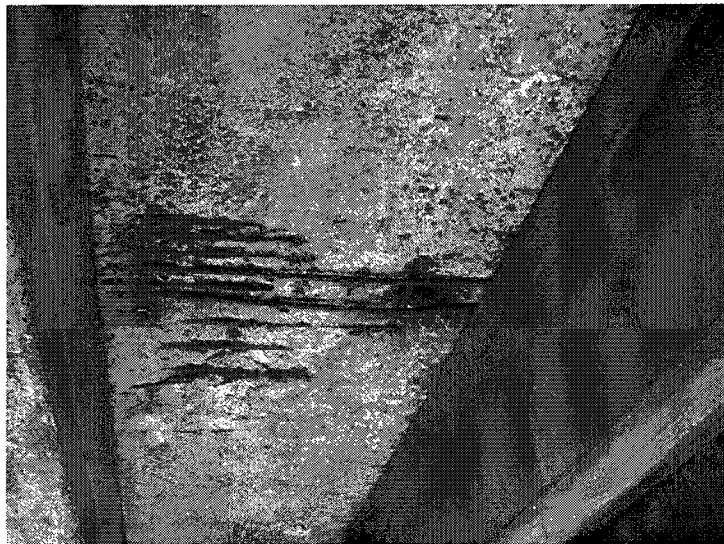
Span 3, Bay #5; Spalled area with corroded rebar extends full width of the bay.
